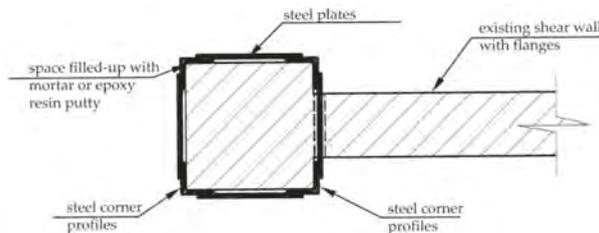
Detail of strengthening solution for structural walls, with steel jacketing interventions on the edges (adapted after [34]).
